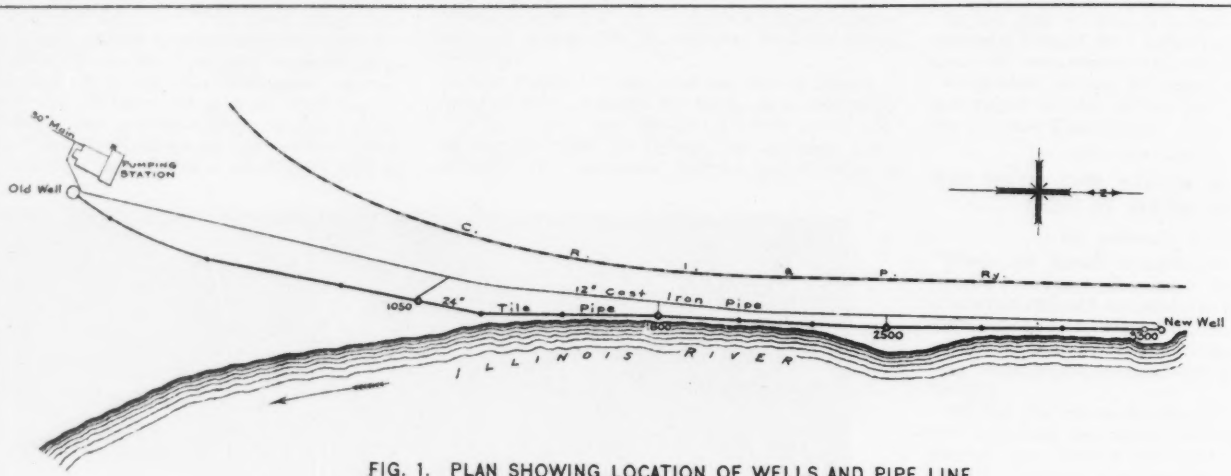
PLAN SHOWING LOCATION OF WELLS AND PIPE LINE.
